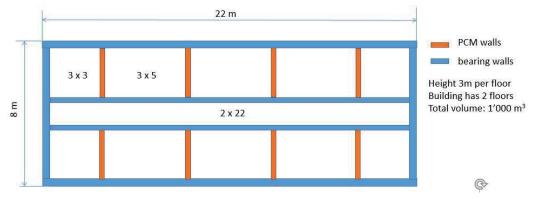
Reference building used for the simulations with bearing and PCM walls.
